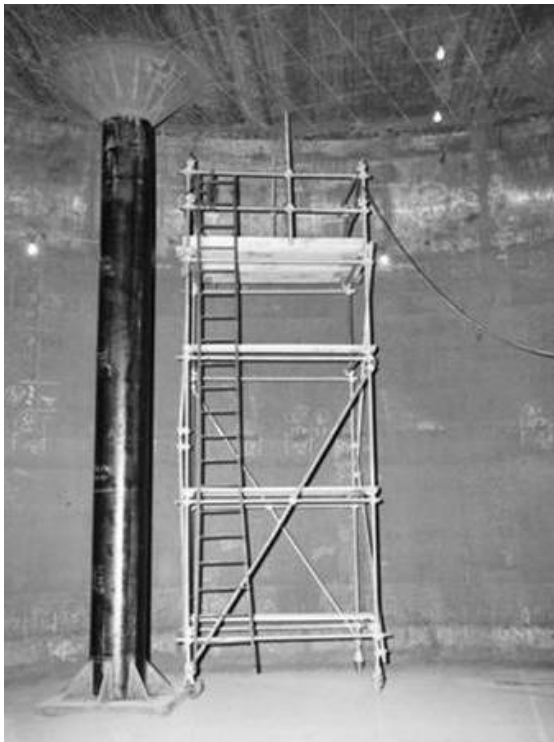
Type I Tank Primary and Secondary Liner Construction
